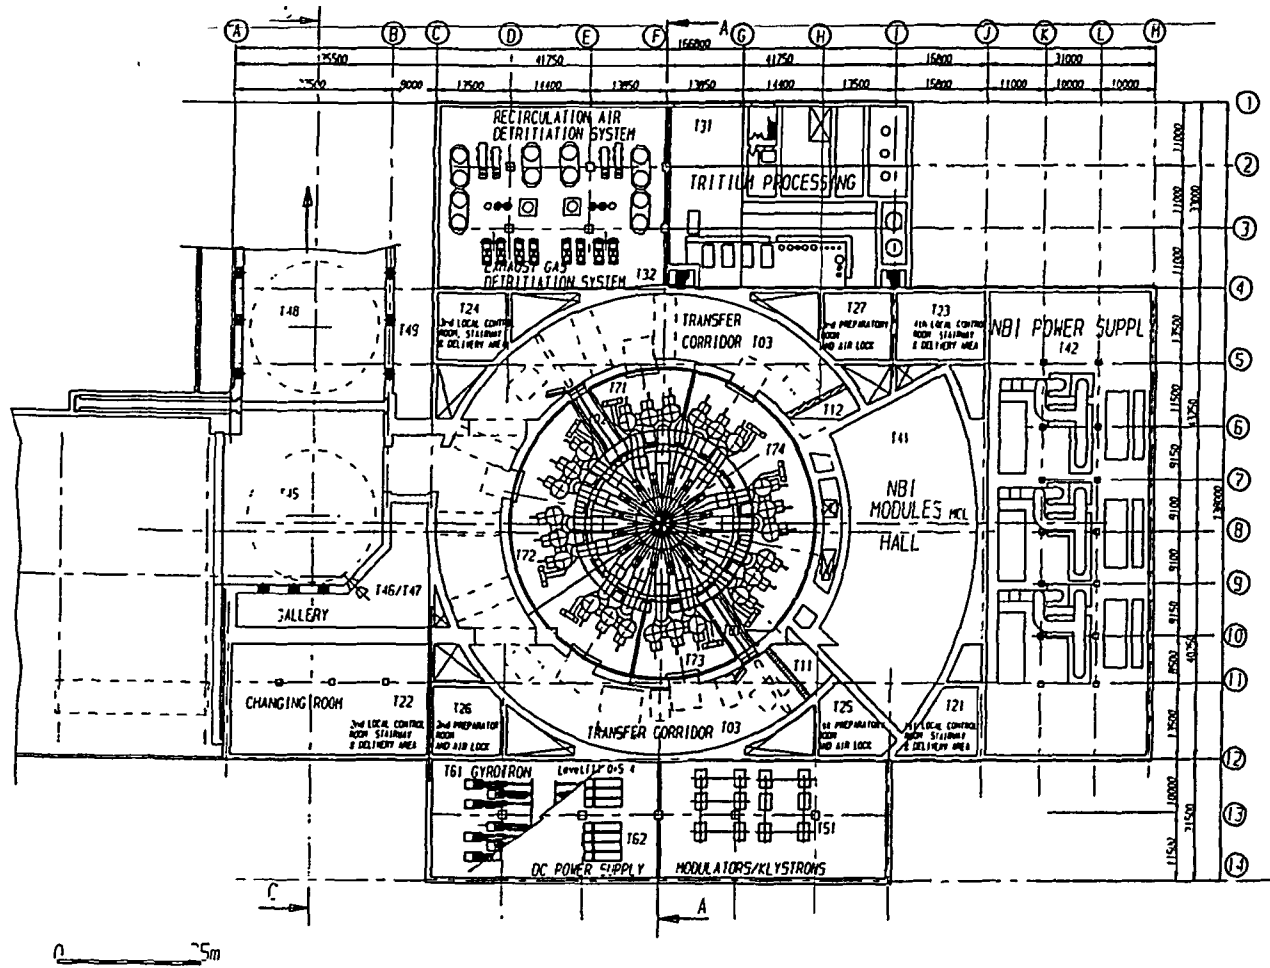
Tokamak building basic requirement scheme plan view (level T)
